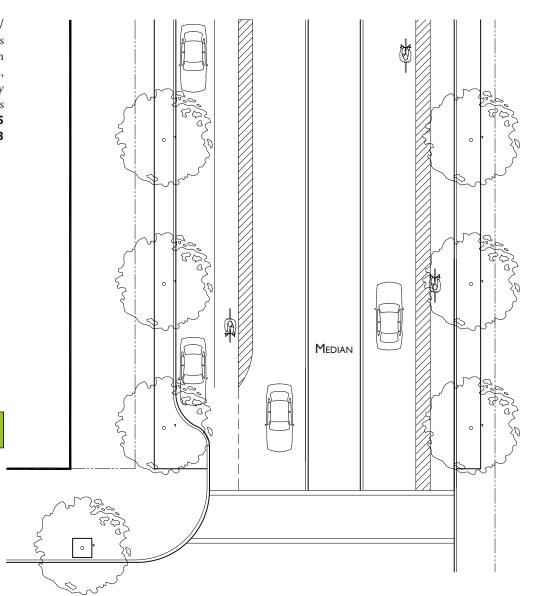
Street Type 10.1: Typical Intersection (Plan View)
